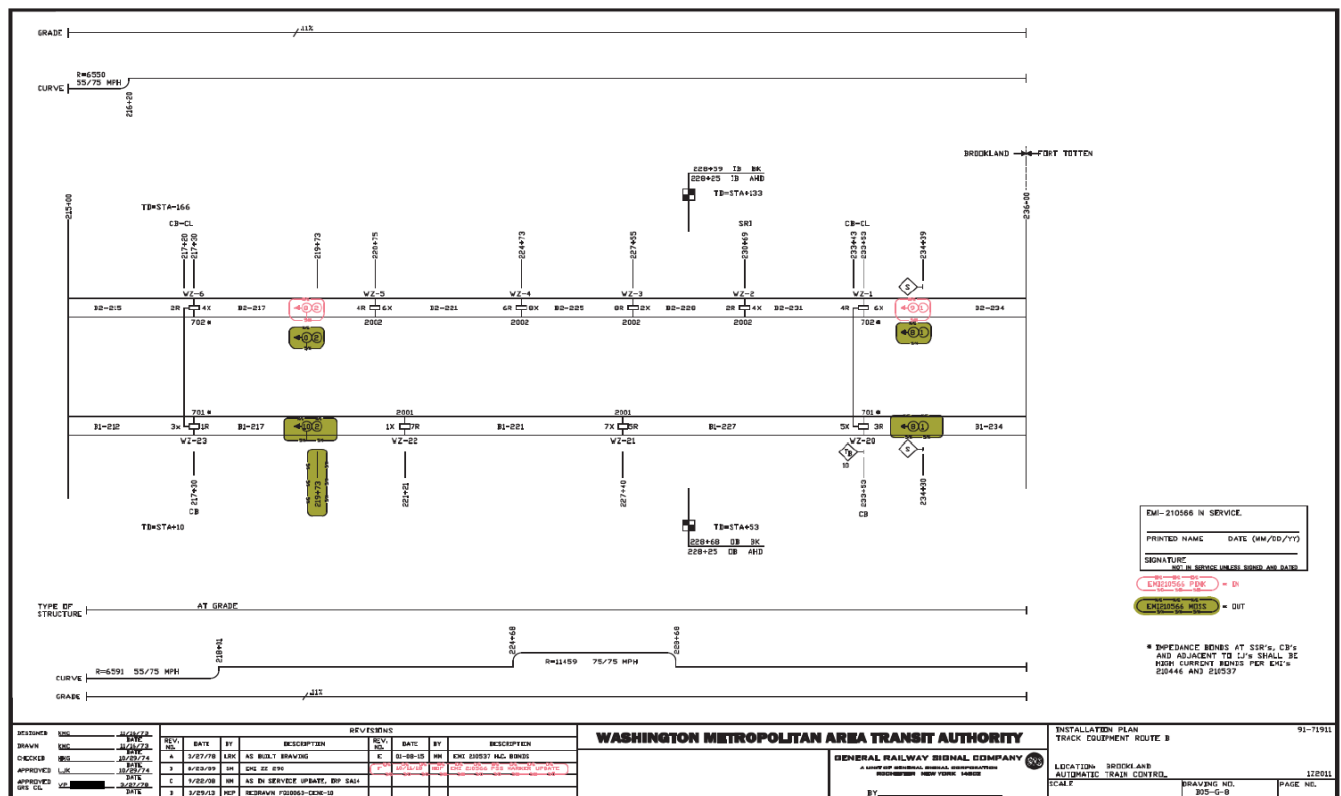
Signal Engineering Book of Plans Drawing B05-G-8.
